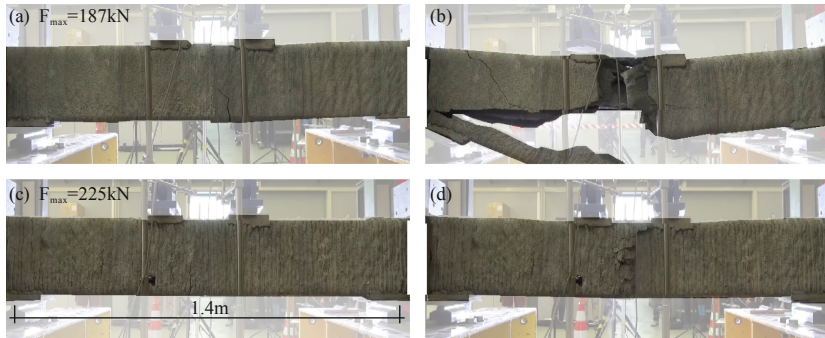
3D printed beams tested in four-point bending: (a) beam without fibre reinforcement right before failure and (b) immediately after failure; (c) beam with fibre reinforcement right before failure and (d) immediately after failure.
